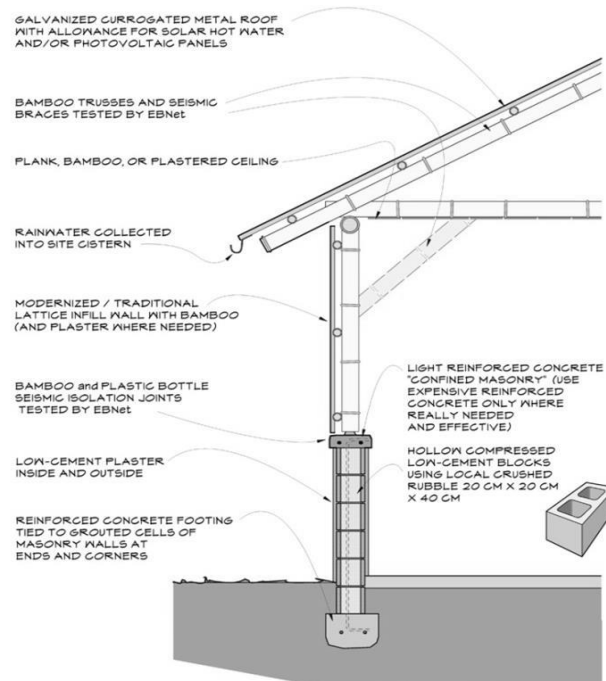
Section View Showing Ecological Building Network's Proposed Structure
